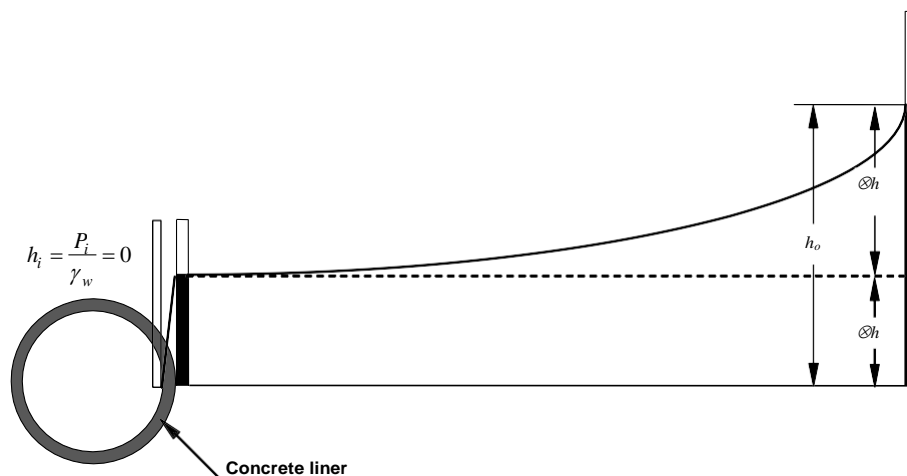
Head Loss across the Lining and Surrounding Ground
